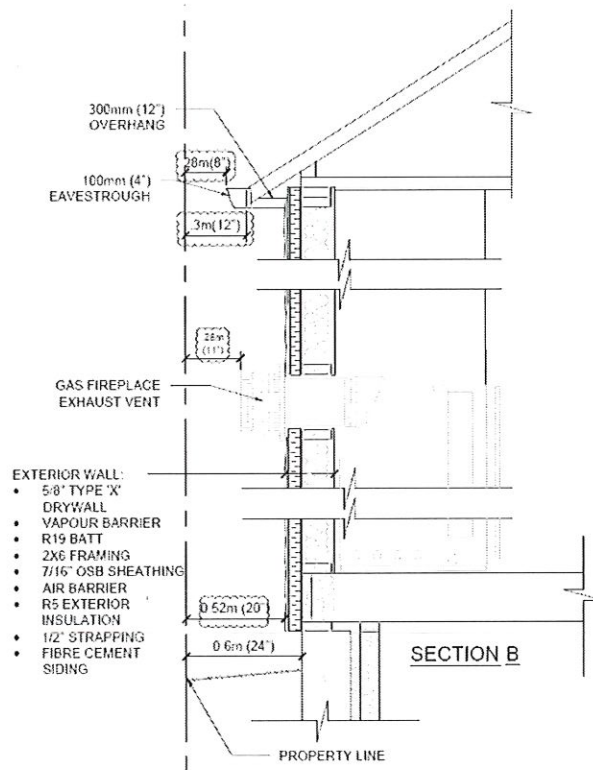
Partial wall section at the 0.6m setback indicated on the site plan.
